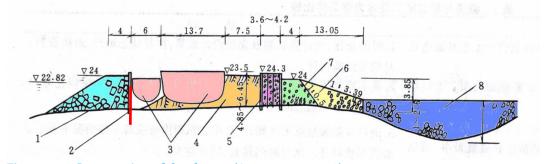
Cross section of the closure (Anonymous, 2008)
